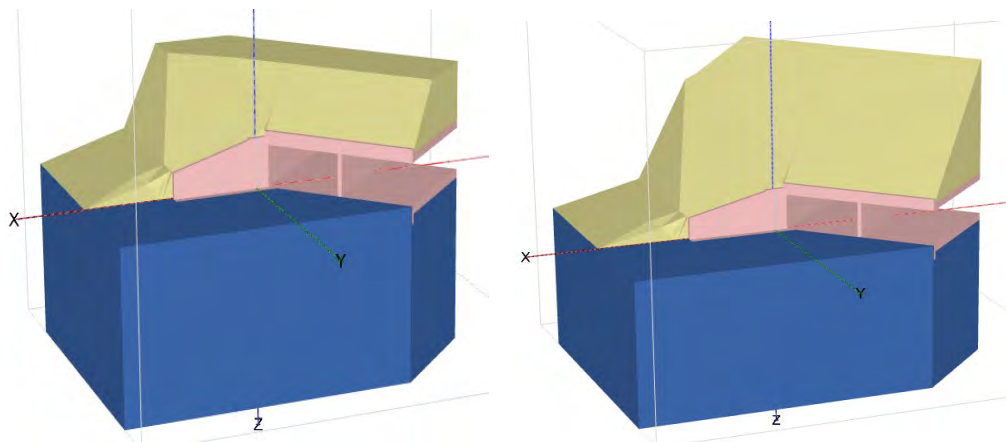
Backfilling 6-ft above the culvert (left picture), and 23-ft above (right picture)
